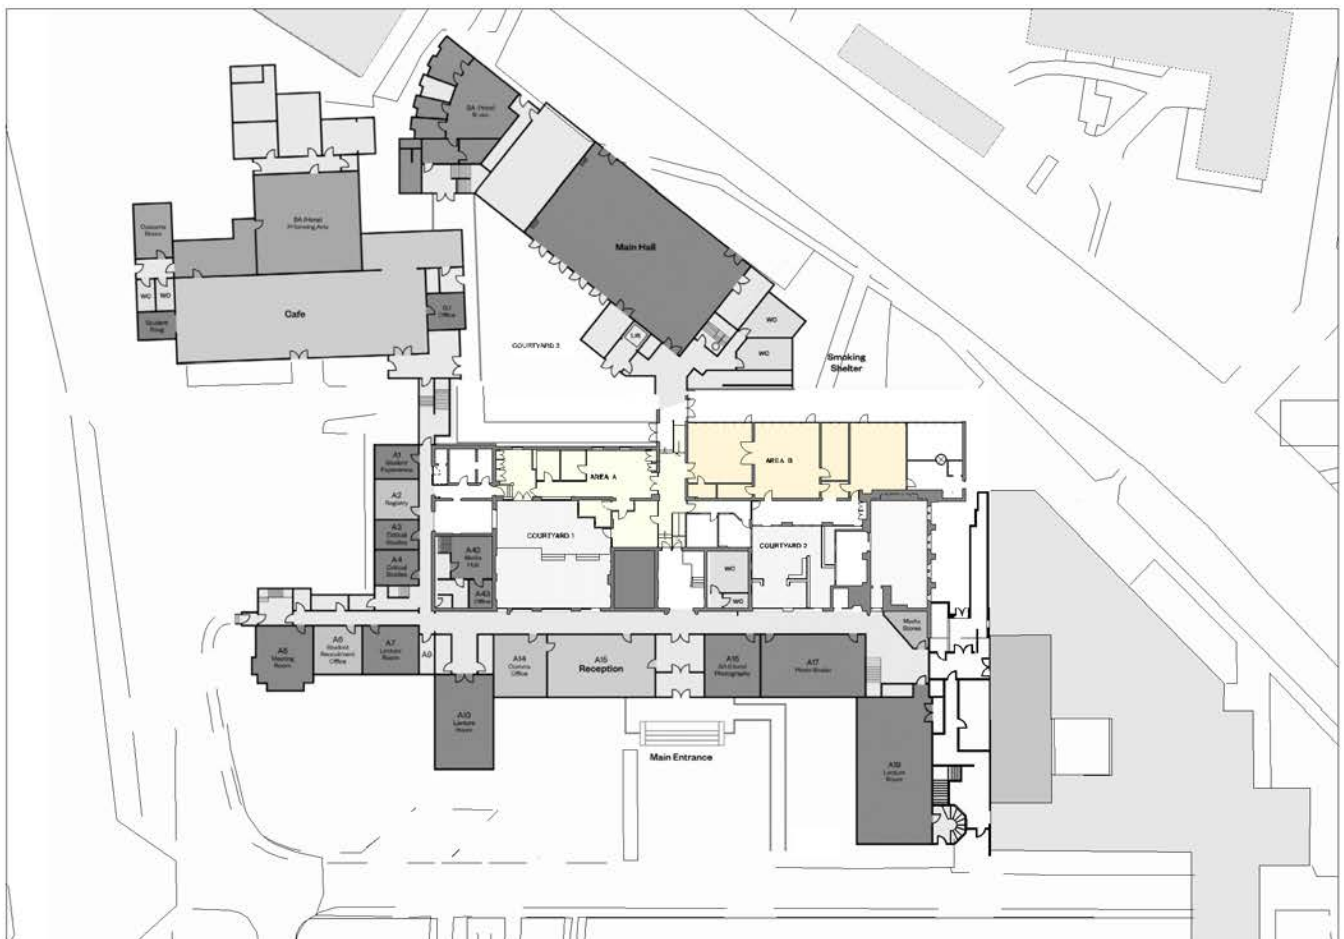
Existing Site Plan showing areas to be altered and refurbished
